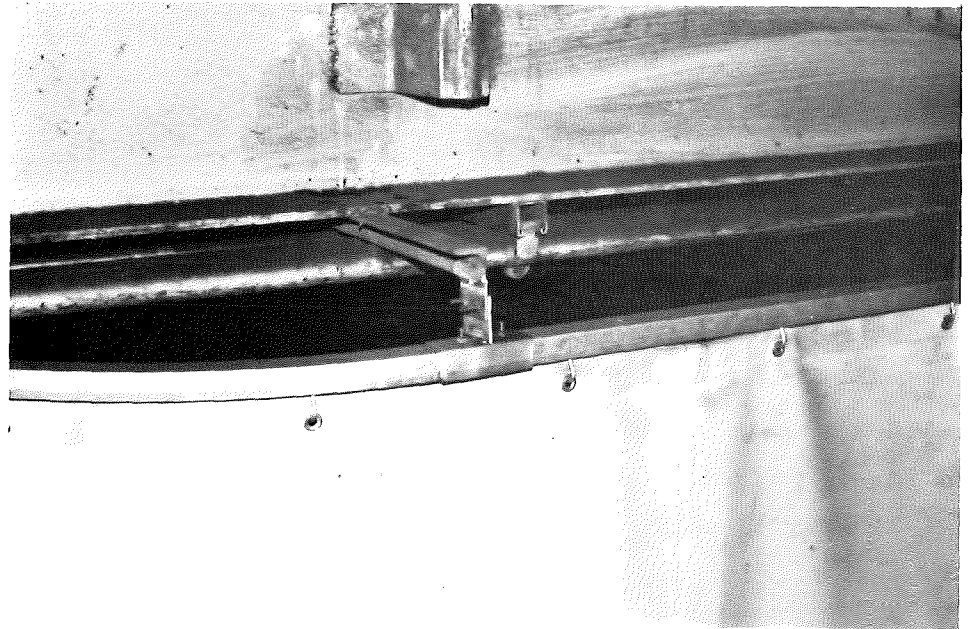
WELDING OF MOUNTING BRACKETS TO BUILDING STRUCTURE.
